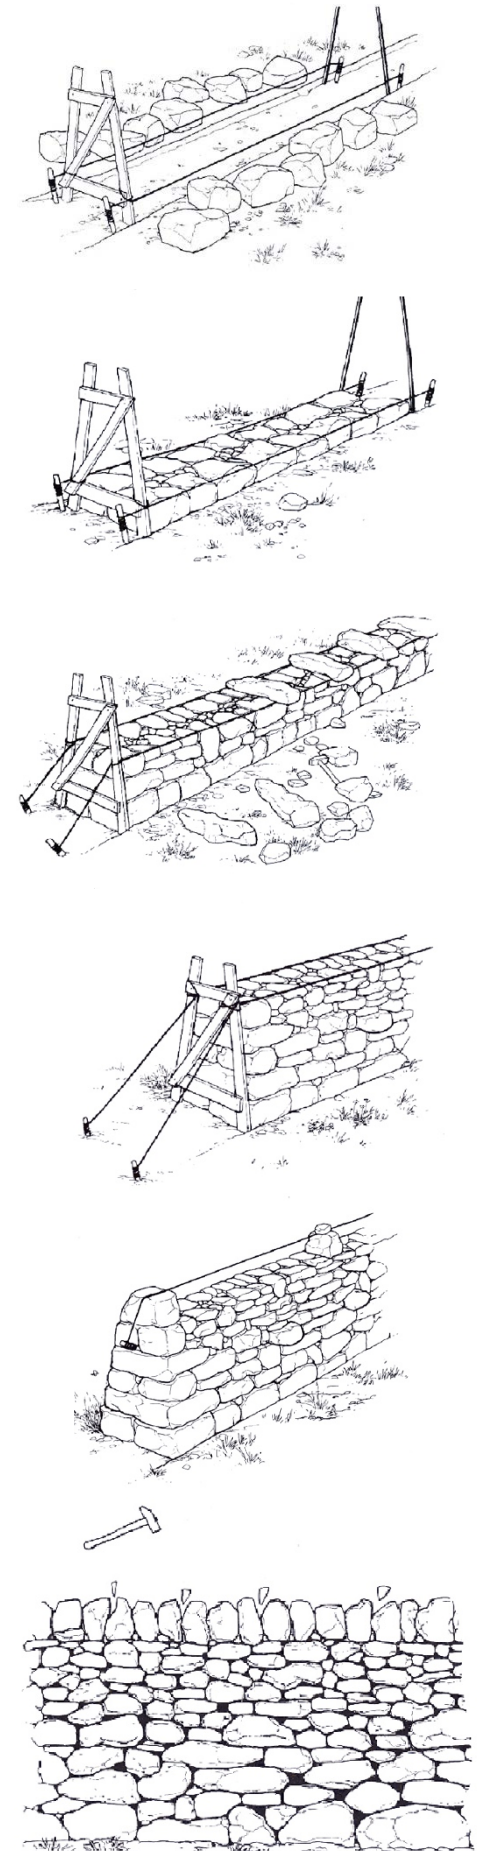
Dry-stone walling: a six step process: 1° Measure and prepare the place | 2° Place big Foundation stones | 3° Add overlapping layers | 4° Fill in the gaps with smaller stones | 5° Remember to place finestones | 6° Complete with copestones. Illustration: Dani Pelagatti and Stiftung Umwelteinsatz, using in accordance with Creative Commons CC-BY-SA-4.0
